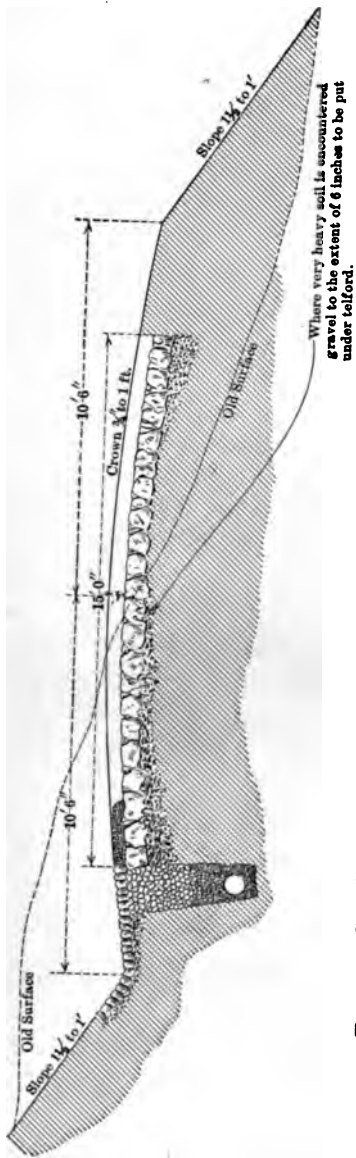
Standard Cross-Section Mass. Highways Showing Telford Pavement with Drain and Gutter at the Side.
